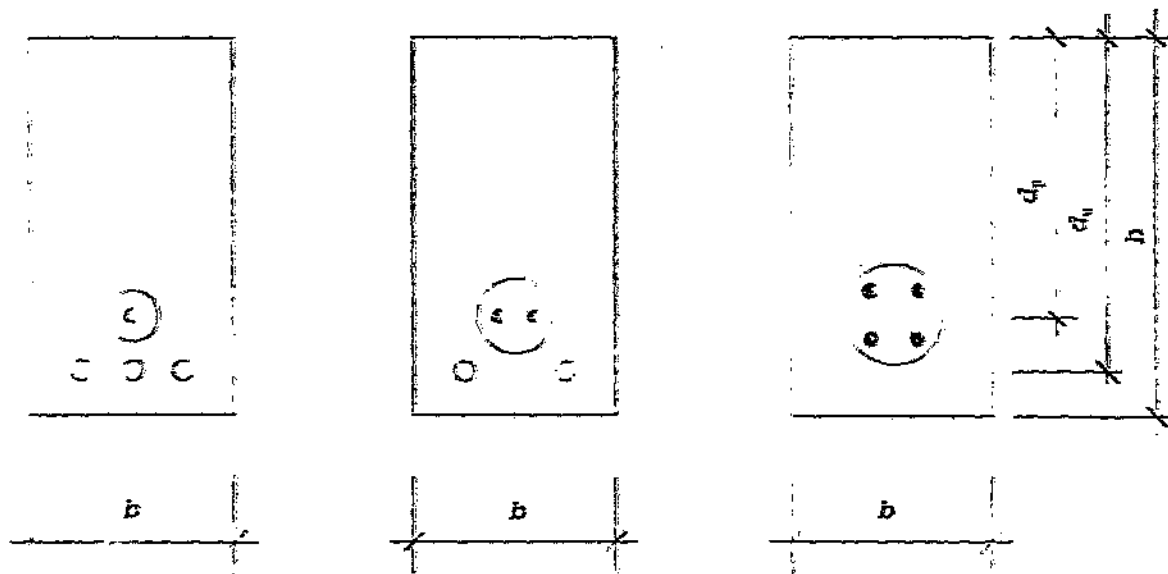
(a) Sections of the test beams from series A (post tensioned bonded strands and deformed bars)
